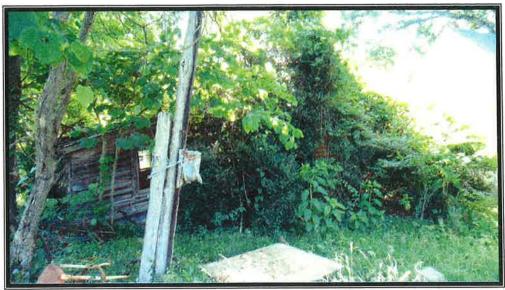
View of kitchen, side (north) elevation addition, looking east.
